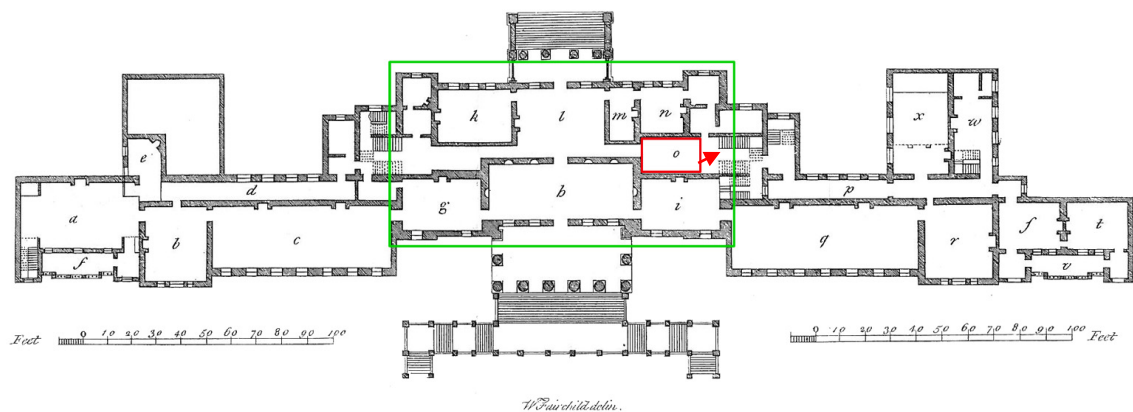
Plan and elevation of the principal floor of Stowe House from Seeley guidebook c1766 (source Stowe House Preservation Trust). The red box indicates the earlier position of the staircase relative to the existing cantilevered staircase).
